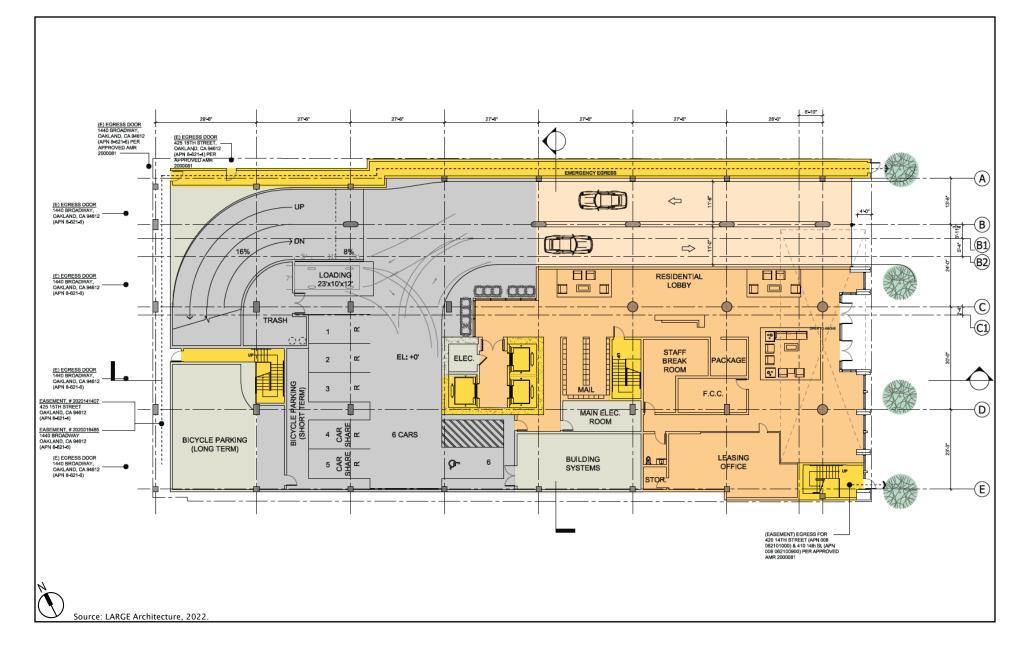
Ground Floor Plan - 1431 Franklin Street Residential Project
